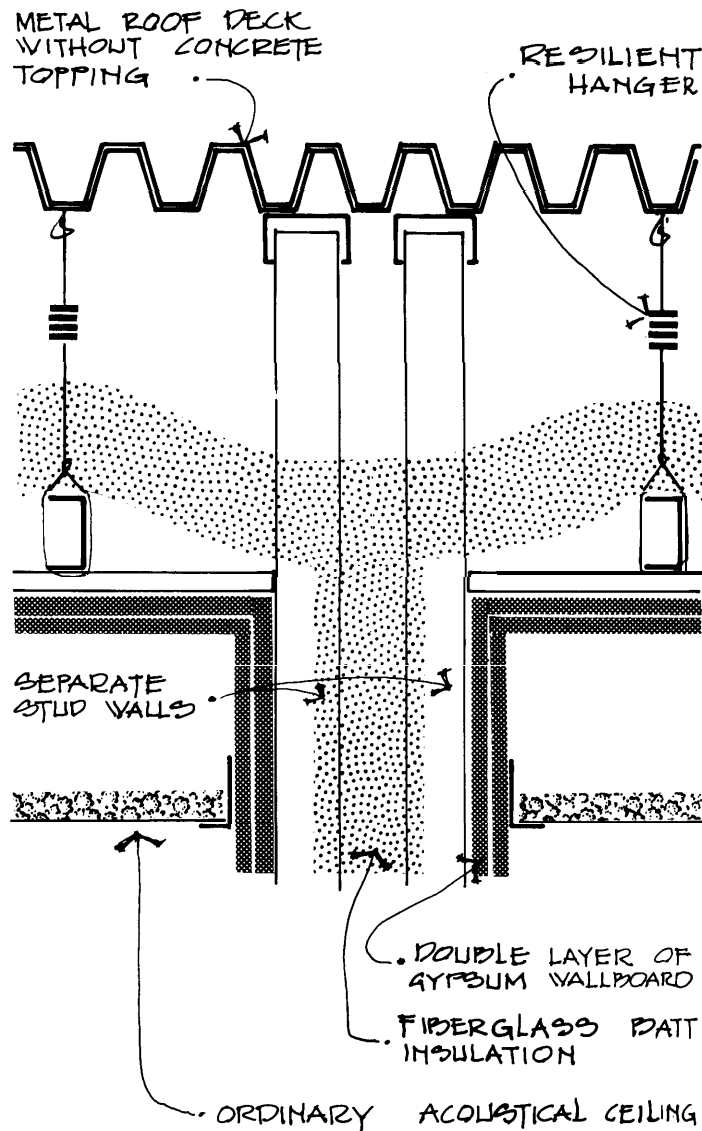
Isolating Music Rooms Under A Metal Roof Deck Without Concrete Topping
